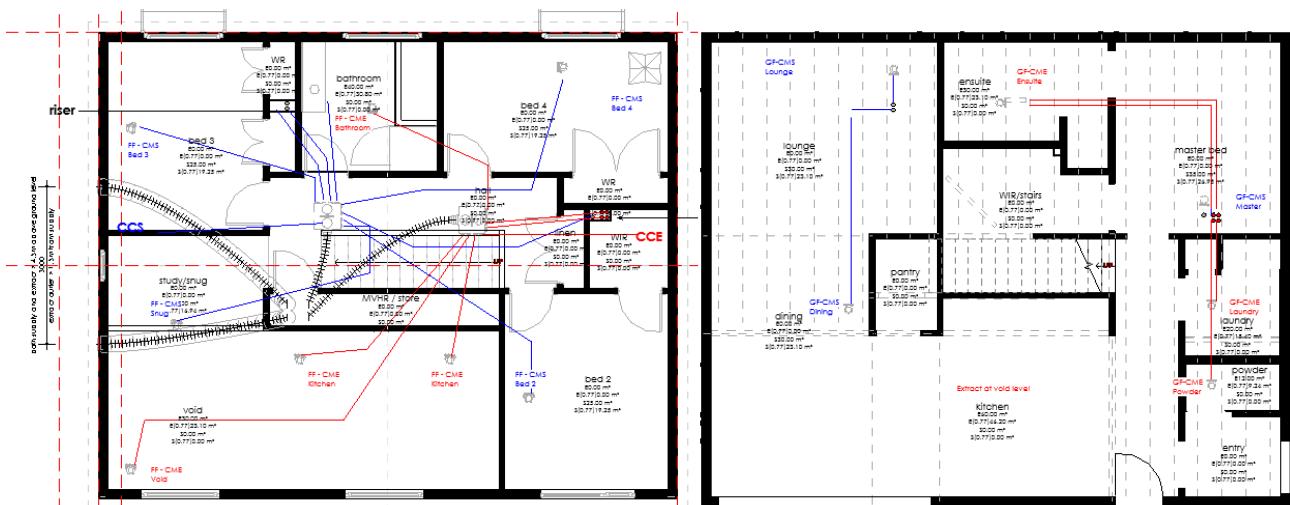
MVHR Plan - Firstfloor and ceiling (left) Ground floor ceiling (right)
